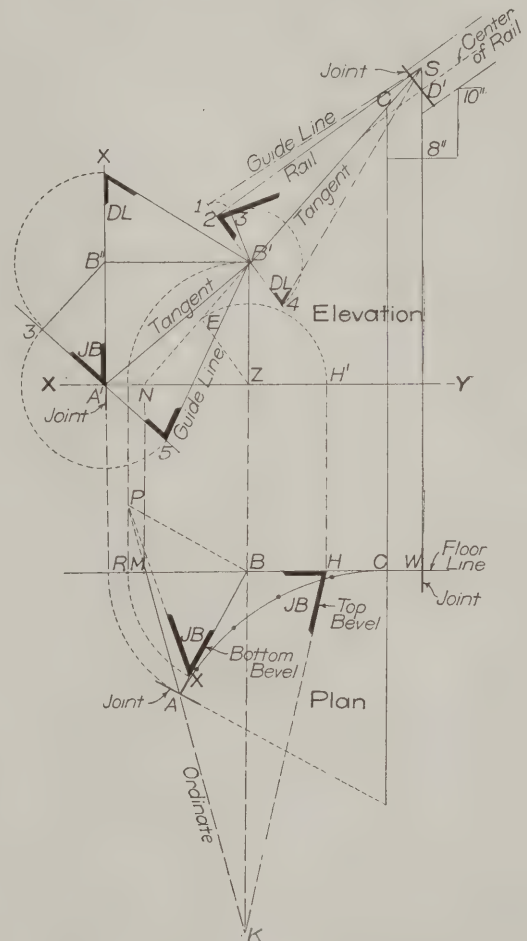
Plan and Elevation Showing How to Find the Joint Bevels and Guide Line
